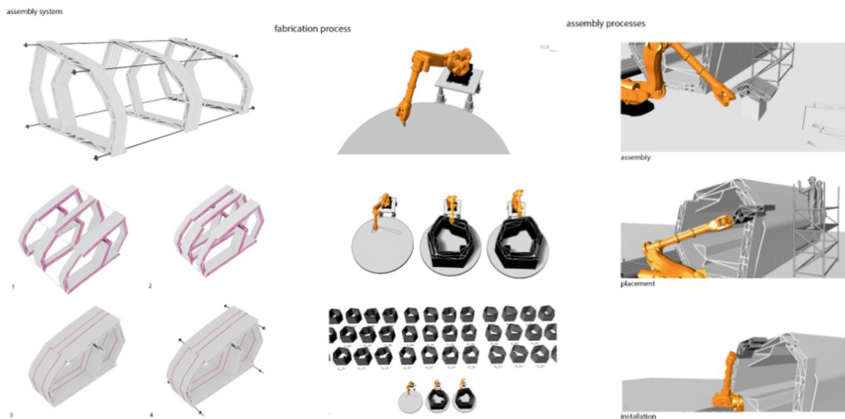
Fabrication process, assembly system and robotic arm, courtesy of CODESIGNLAB
